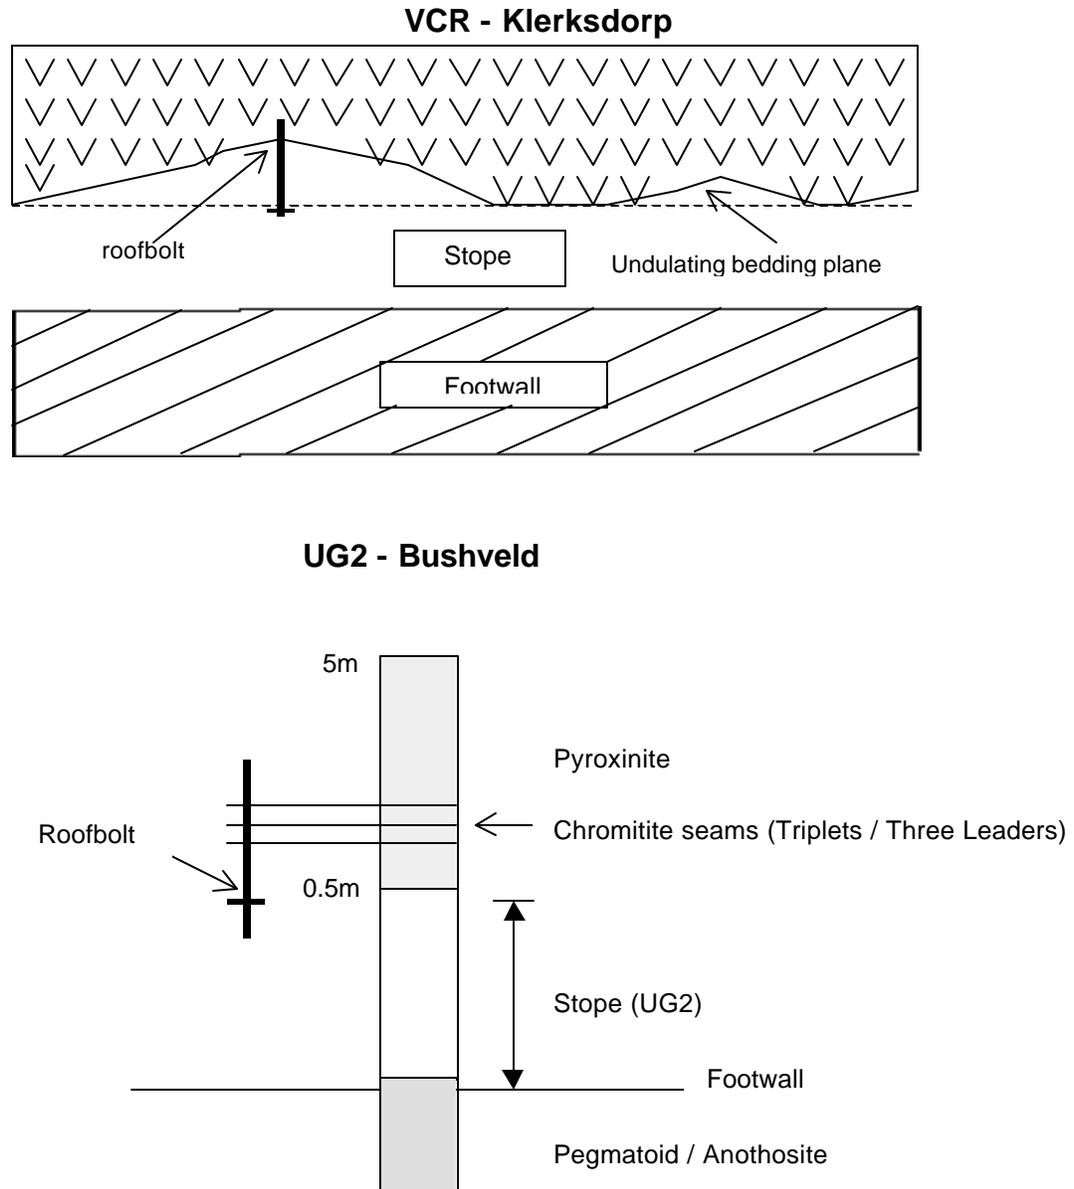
Roofbolting of the undulating bedding fault, VCR Klerksdorp and a geological section through UG2, Western Platinum mine, indicating application of rockbolting.
